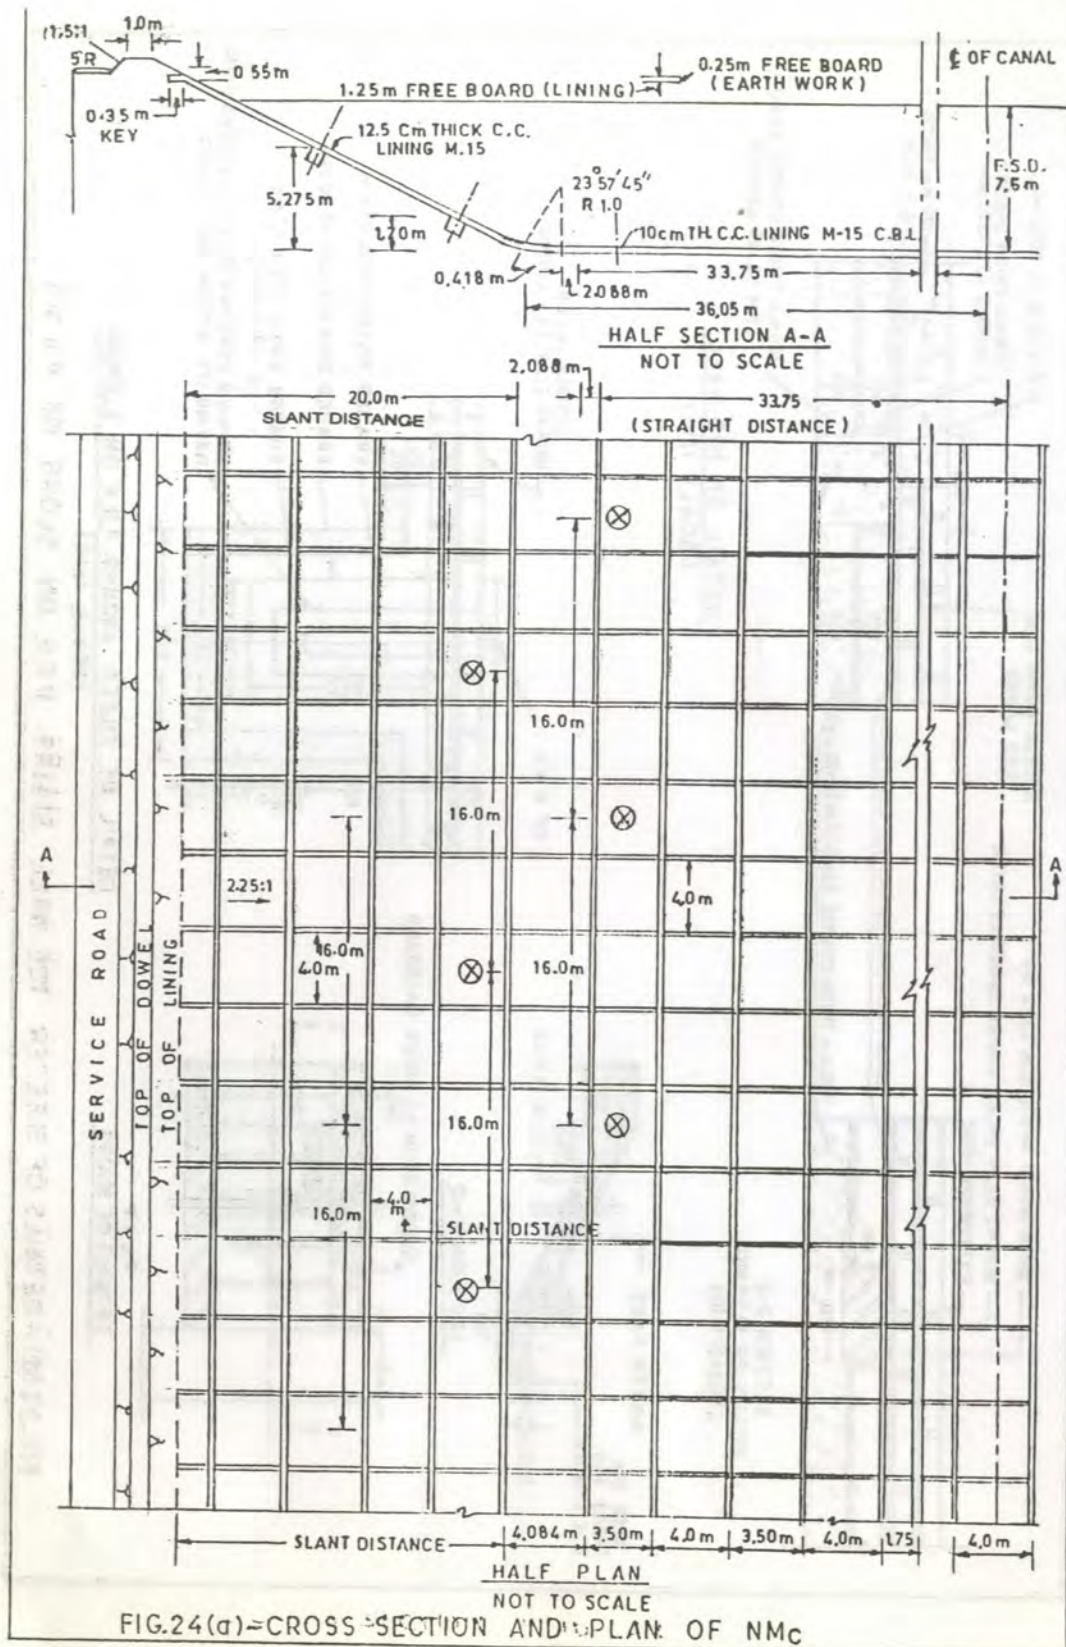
(a)=CROSS-SECTION AND PLAN OF NM_C
